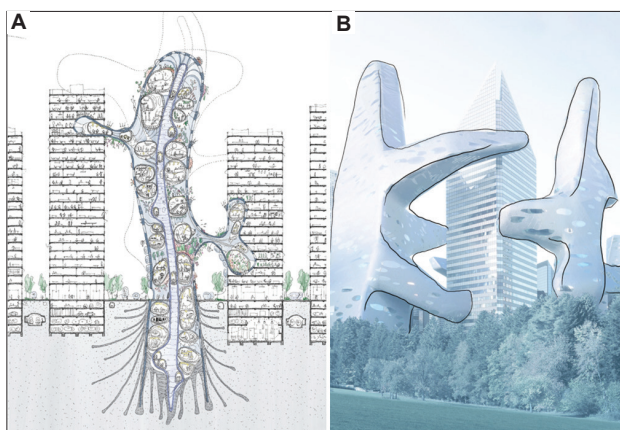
Inside and outside of the Biosynthetic Tower. (A) The overall structure of the building adopts the outline of a tree, where roots act as foundations and energy supply and where a central core branches out to support the different rooms and to serve as a guide in its extension and connection with other towers and buildings in its immediate surroundings. (B) Simulation of how the fully developed Biosynthetic Towers could become integrated in the pre-existing urban landscape
